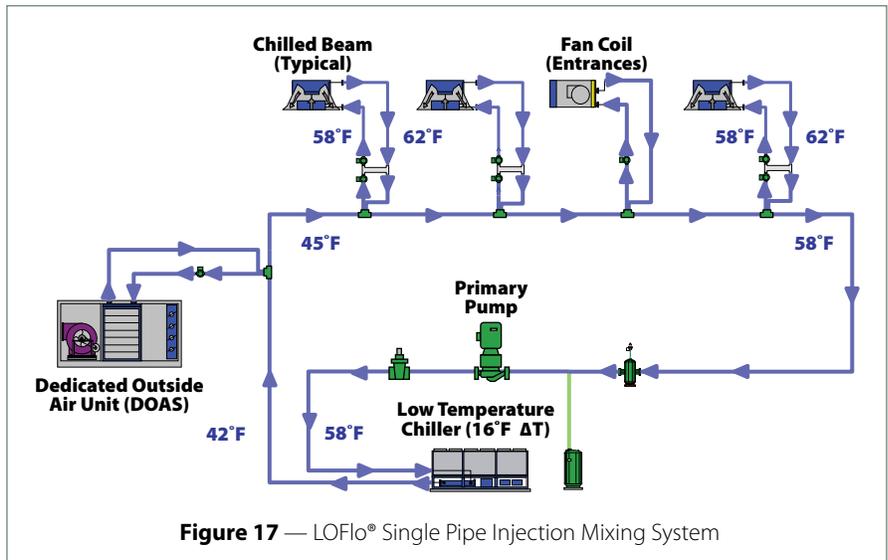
LOFlo® Single Pipe Injection Mixing System
